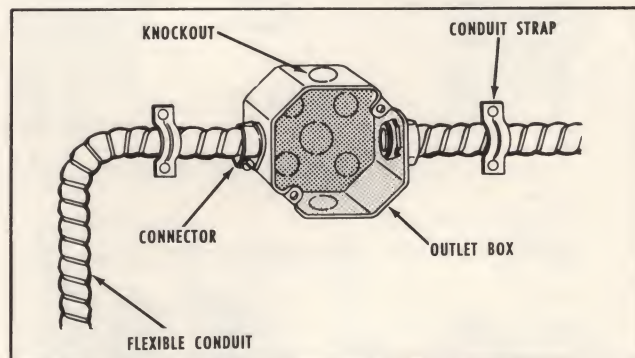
FLEXIBLE CONDUIT INSTALLATION
